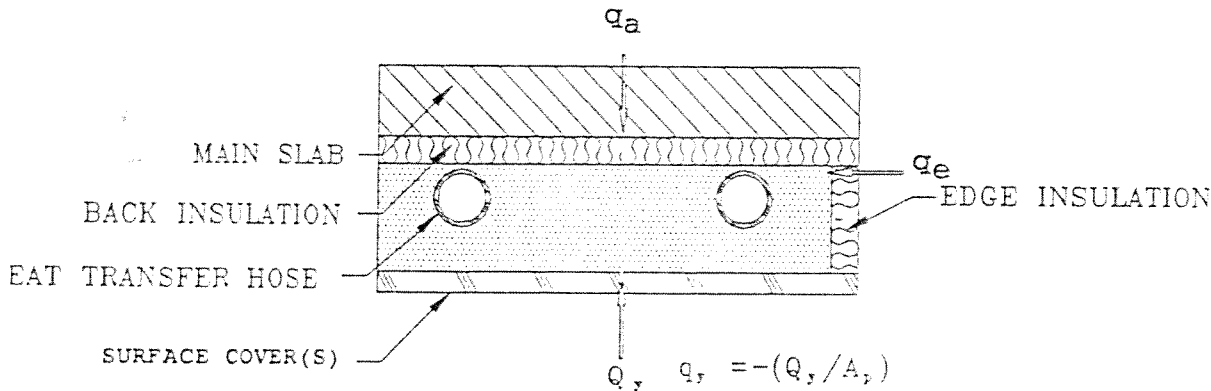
In-slab Type Ceiling Cooling Panel Construction.
